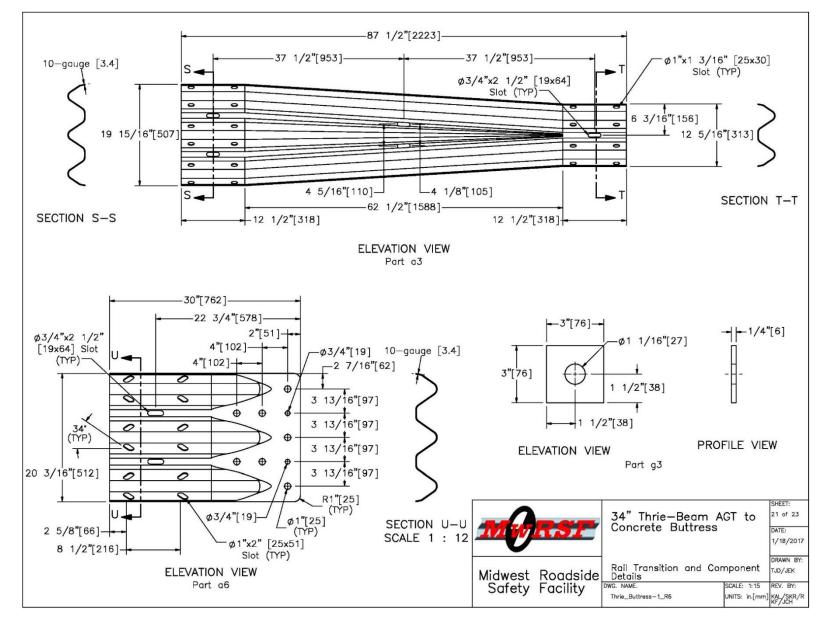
Rail Transition and Component Details, Test Nos. 34AGT-1 and 34AGT-2
